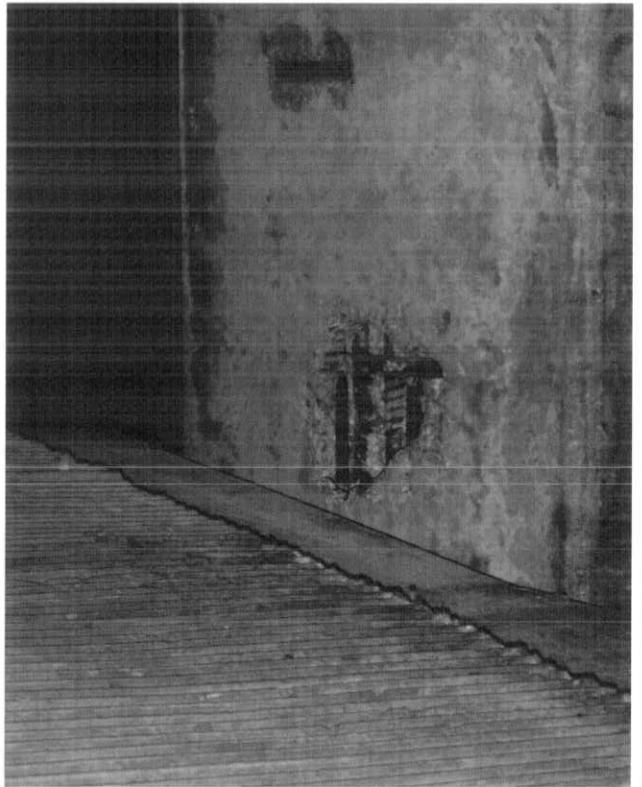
TYPICAL VIEW OF BEARINGS ON PIER.
